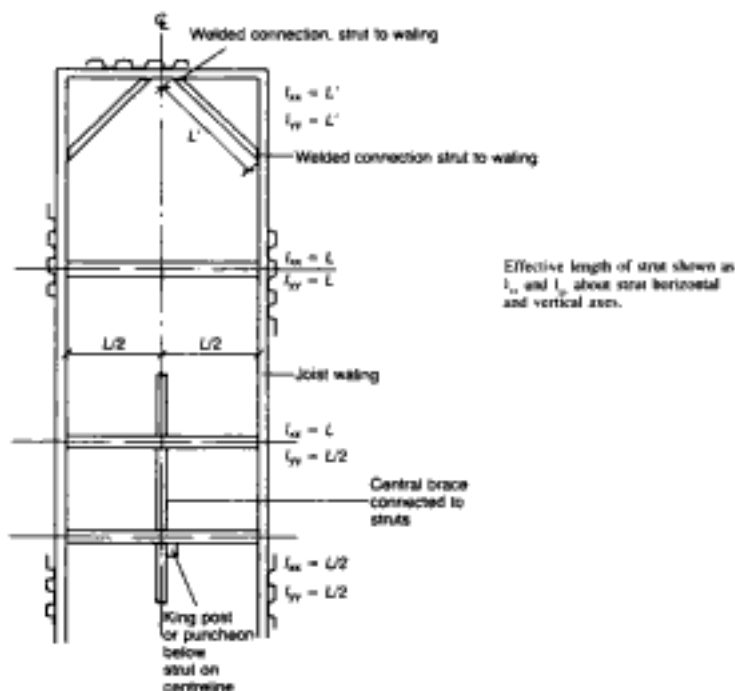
Plan of cofferdam construction showing effective lengths of struts used in design
